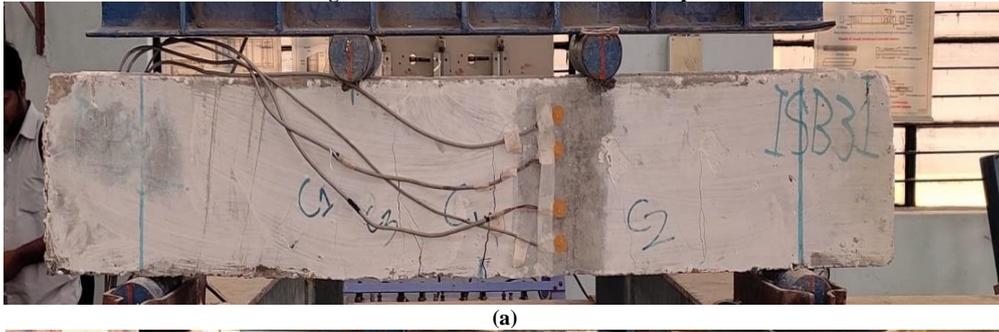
RC beam specimen with basalt rebar inclined shear reinforcement for two shear spans (Flexural reinforcement will be conventional steel)
